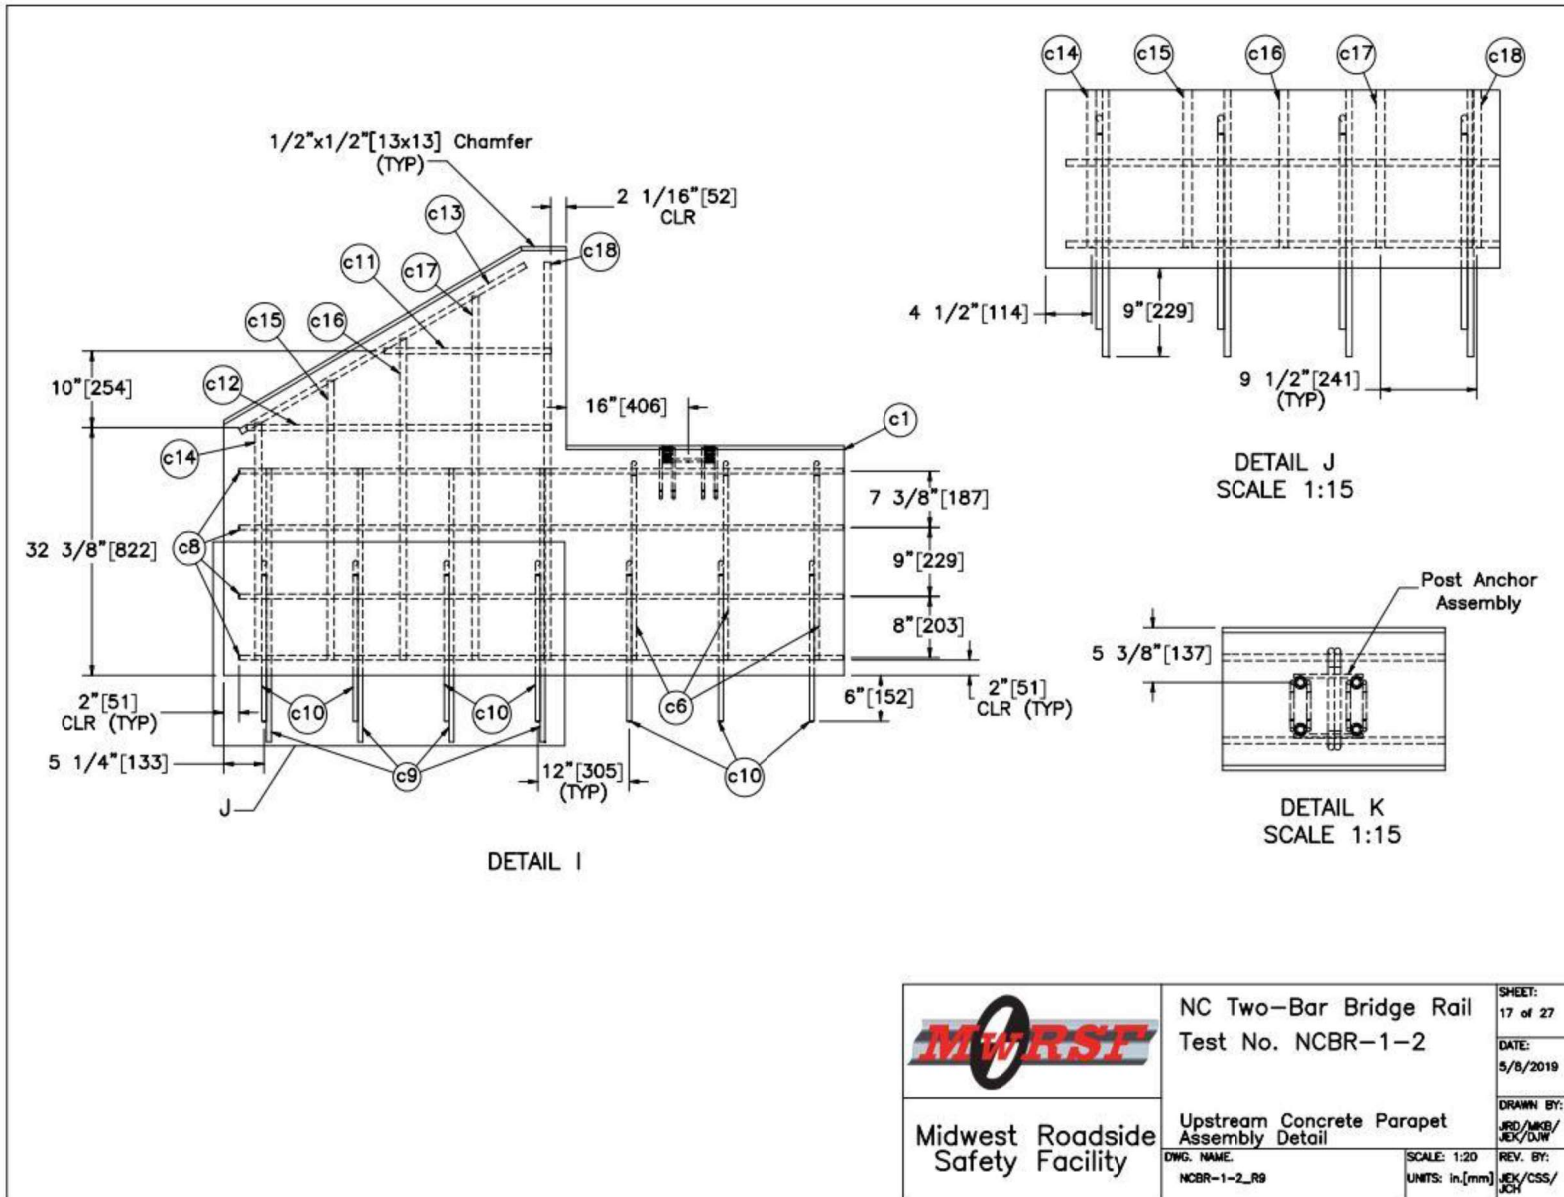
Upstream Concrete Parapet Assembly Detail, Test Nos. NCBR-1 and NCBR-2
